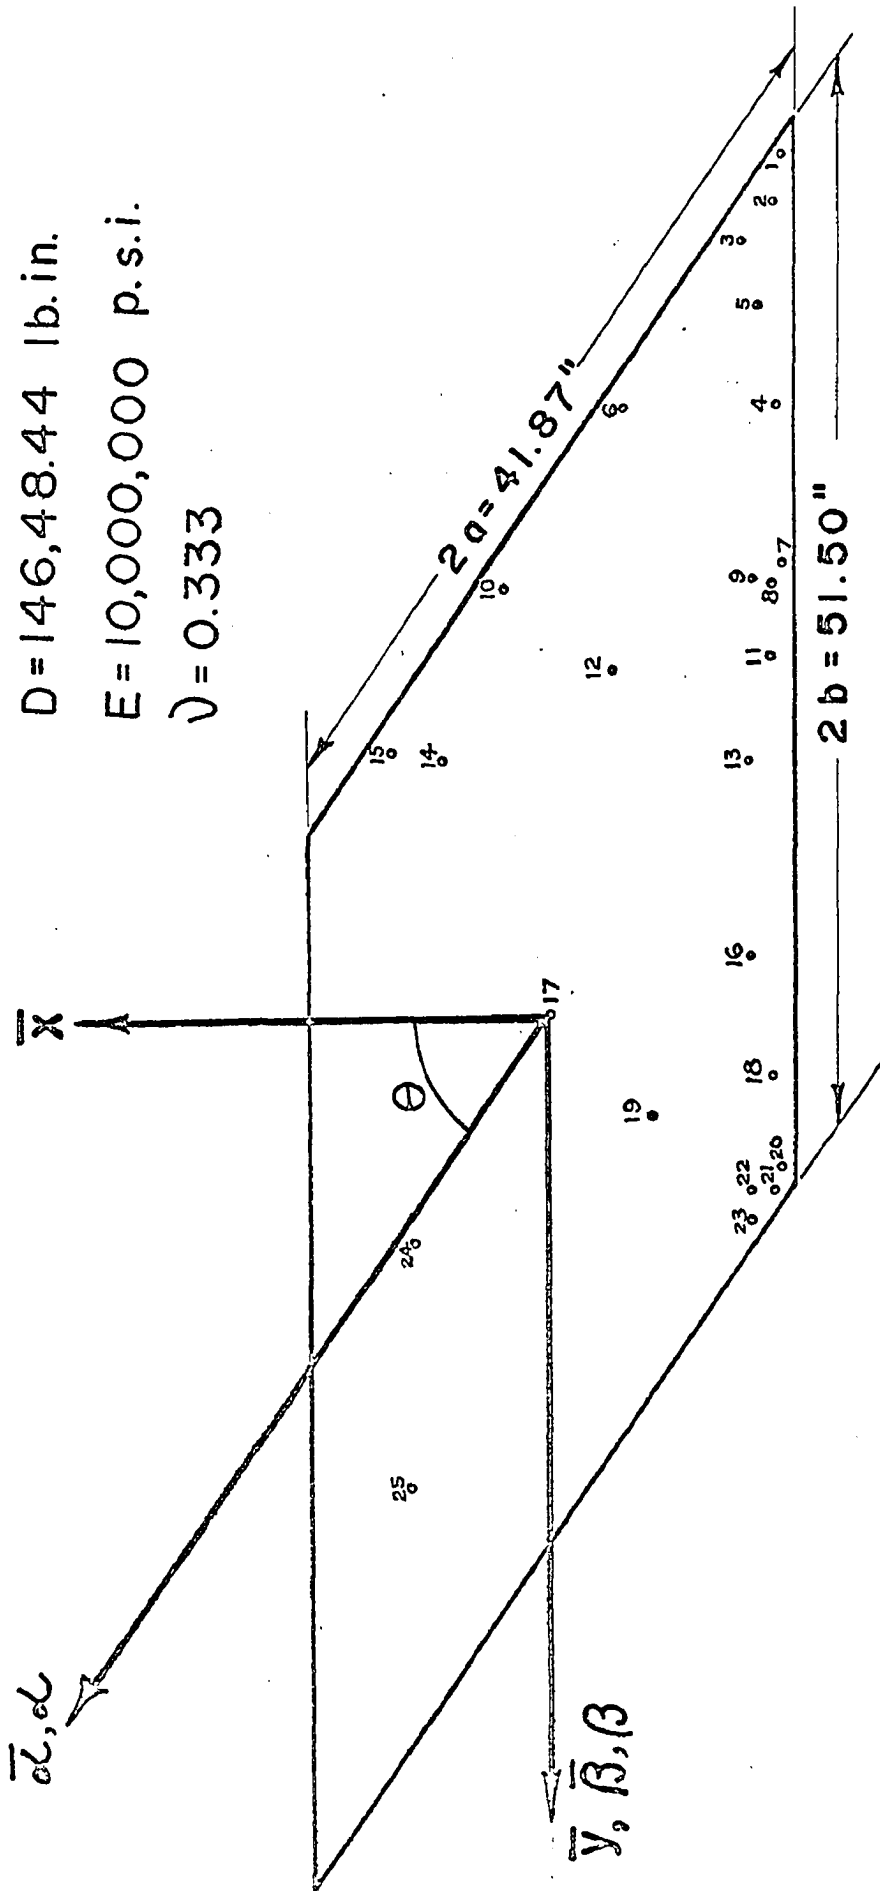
DIMENSIONS OF SKEW PLATE AND LOCATION OF ROSETTE GAUGES ON BOTTOM SURFACE
